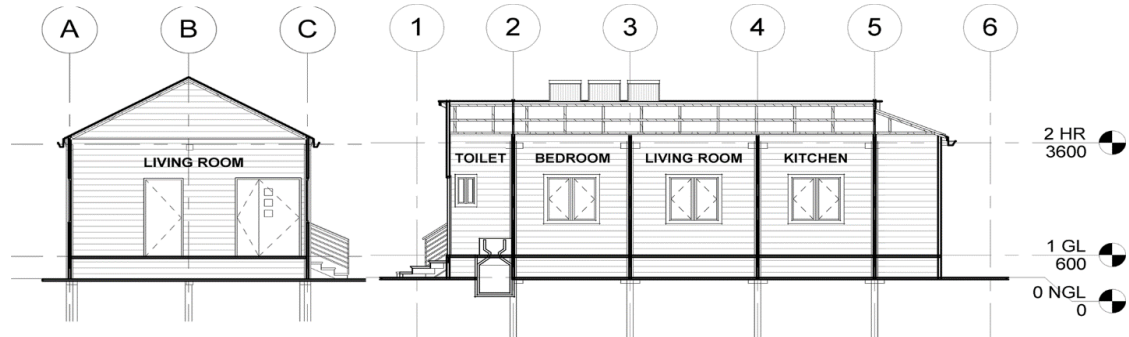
Prototype's Transverse and Longitudinal Sections respectively.
